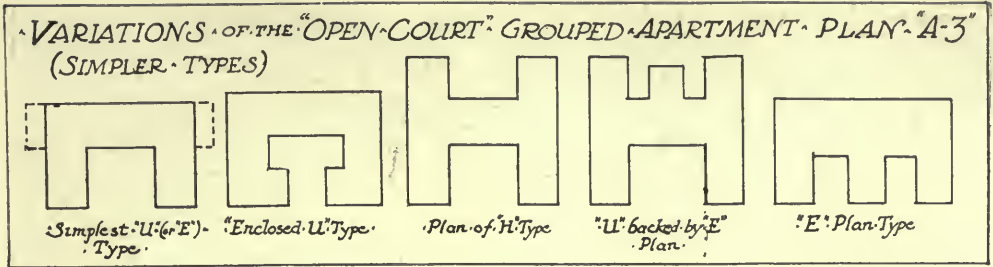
THE SIMPLER TYPE OF "OPEN COURT" APARTMENT PLANS.
